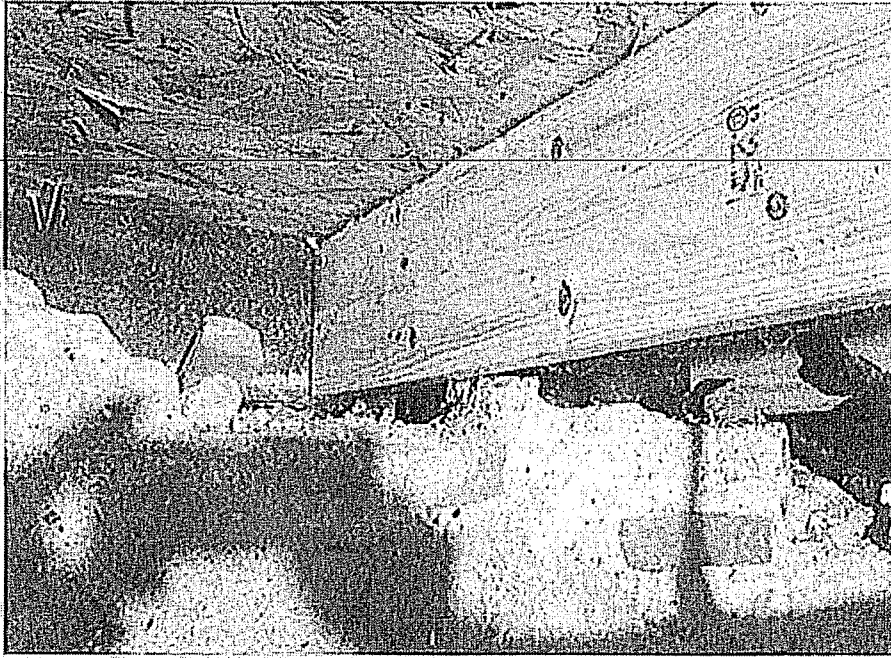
New floor joists not bearing on foundation wall, supported by rim joist.
